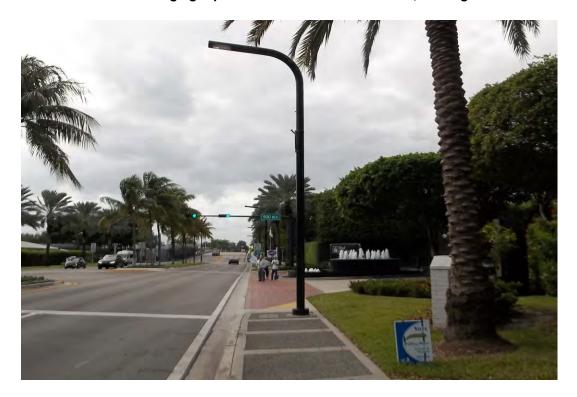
Existing light pole on the north side of 96<sup>th</sup> Street, looking west.
